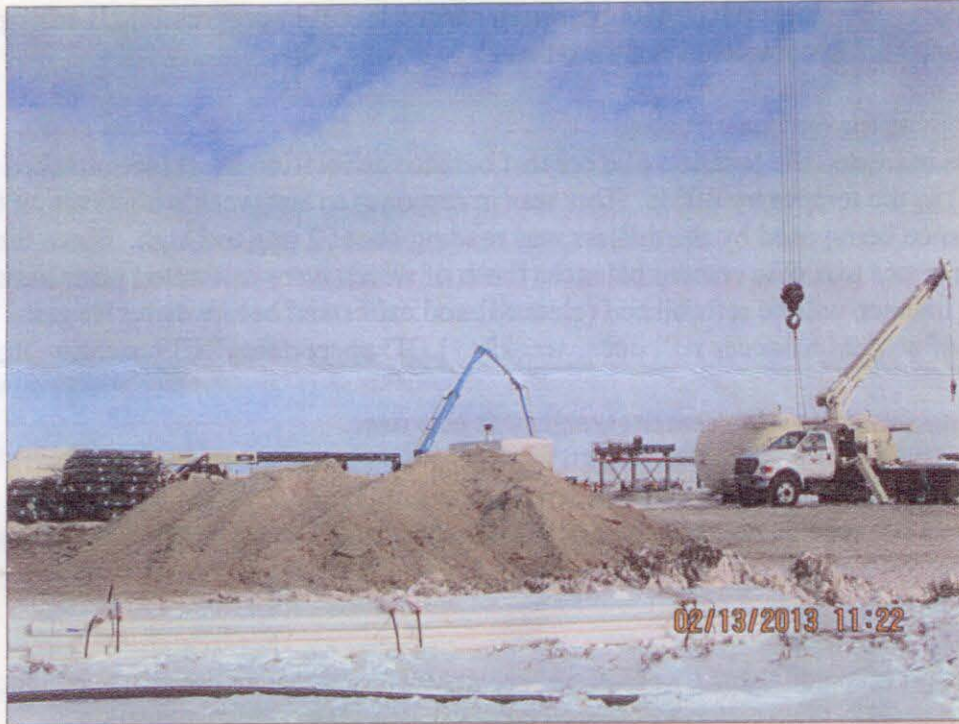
This depicts the concrete pumper (blue boom) being used at the plant site.
